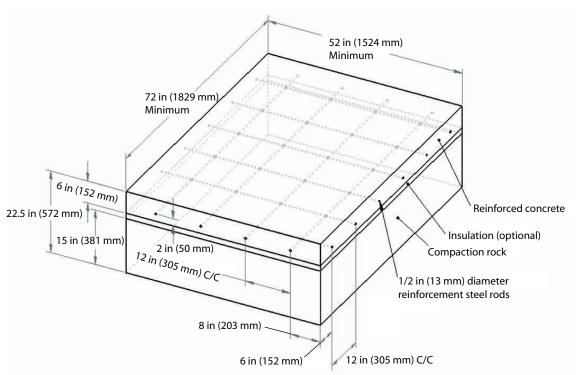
illustrates the concrete slab detail for a typical outdoor application.
